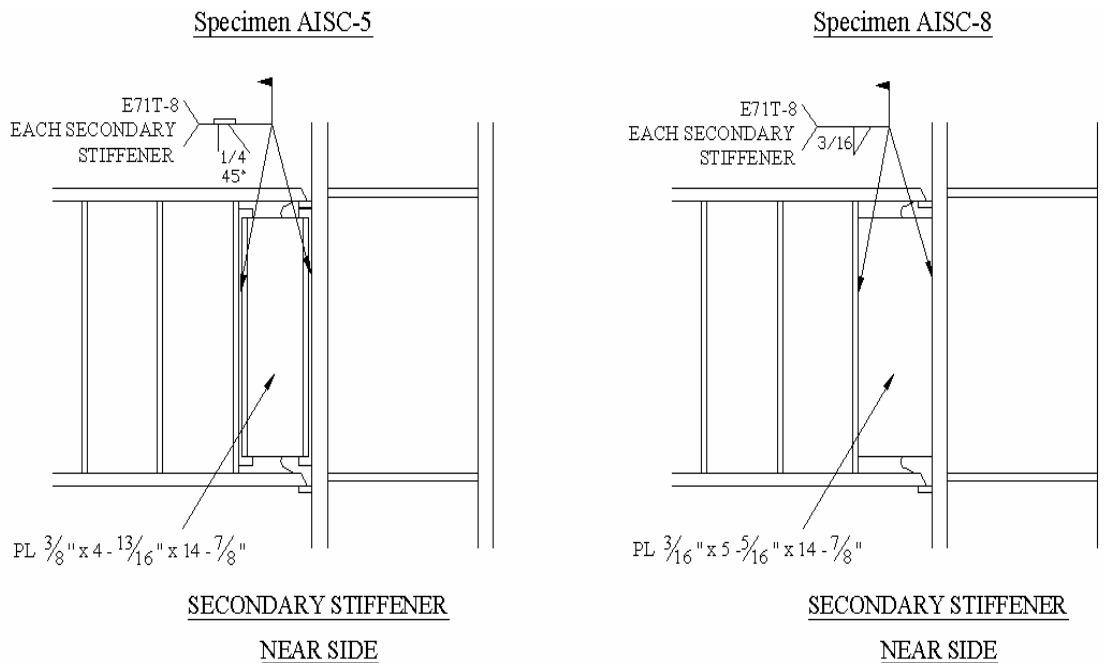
Specimens AISC-5 & 8 – Secondary Stiffener Detail
